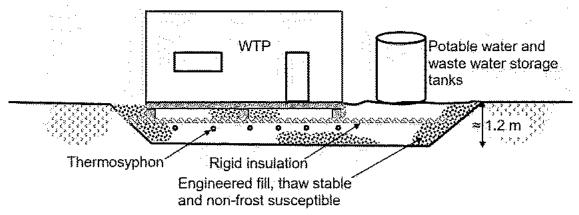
Sketch of water treatment plant and layout of external water storage tanks. (For illustrative purposes only; not to scale).
